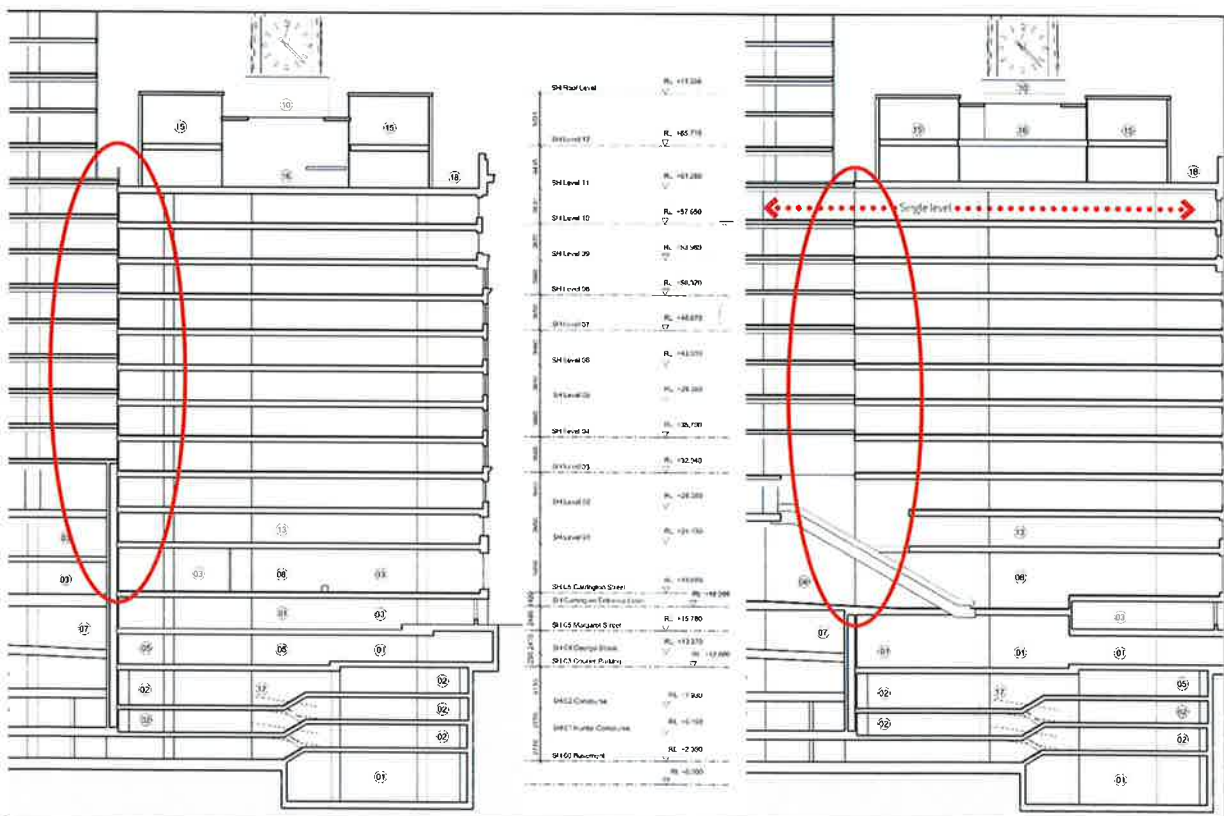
Amendments to Shell House, approved (left) and proposed (right) ground level layouts (Source: Applicant's Response to Submissions)
